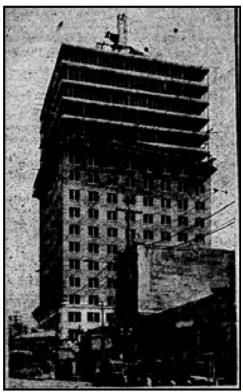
The Allen Building with brickwork completed to the fourteenth floor (*Dallas Morning News*, 7 March 1926:1).
